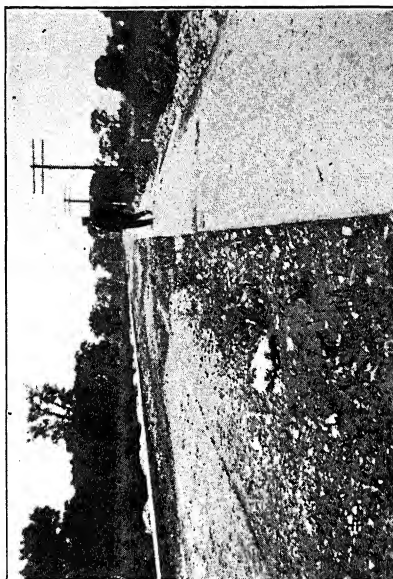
C.—Central portion of pavement not yet constructed. Concrete shoulders in place.
